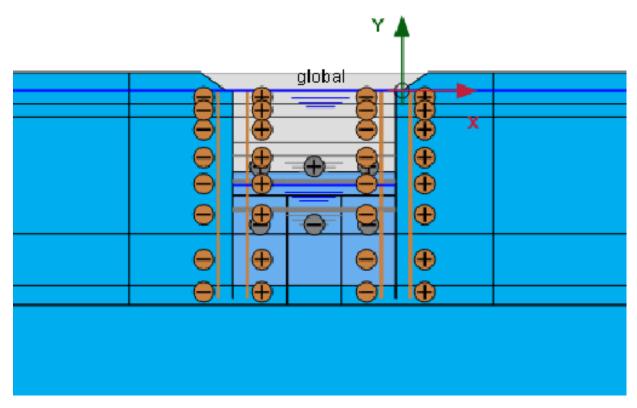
Setting of local groundwater level inside of the structure –Stage of construction nr. 6
